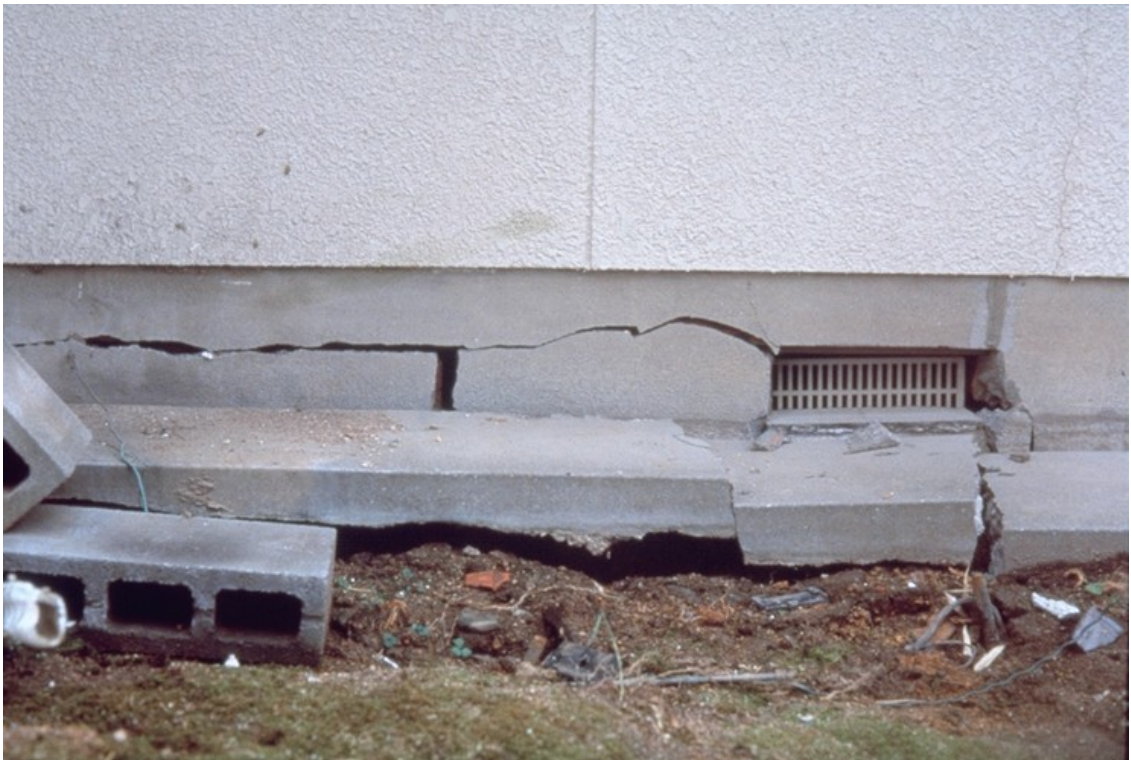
Damage on a foundation (Rank C)
